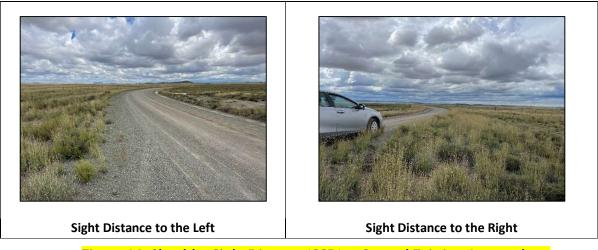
Shoulder Sight Distance (SSD) at Second Existing Access along Burgerville Road
